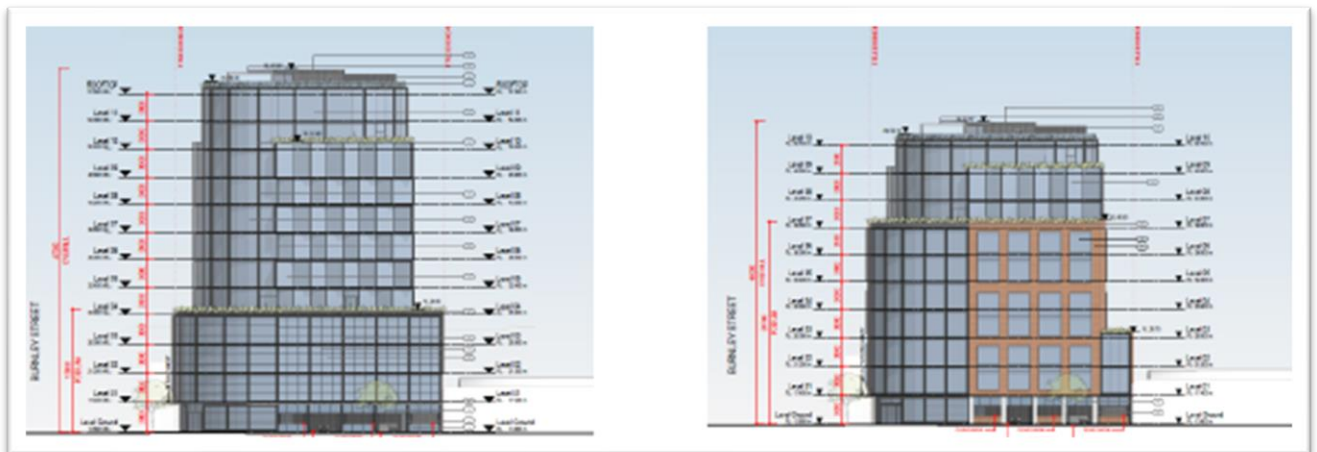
Original 12-storey (left) and amended 10-storey (right)
